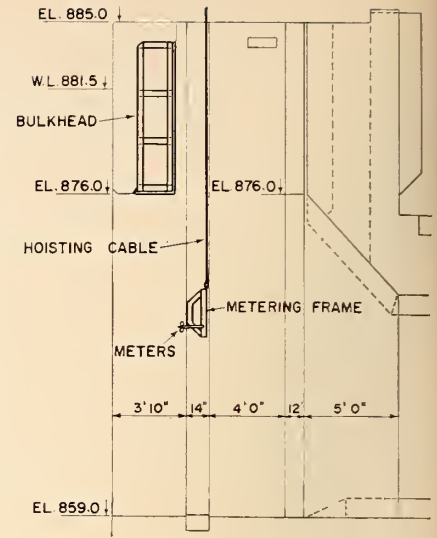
Bulkhead installed at intake of low head plant to develop a satisfactory metering cross-section.
